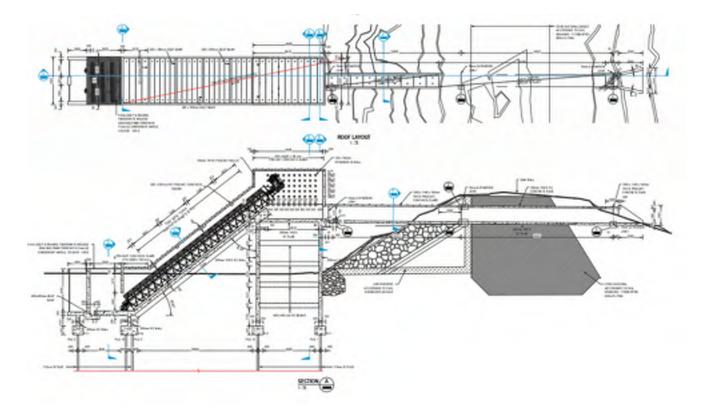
Screenshot form Detail Design Drawing (For drawing please refer to Appendix C)
